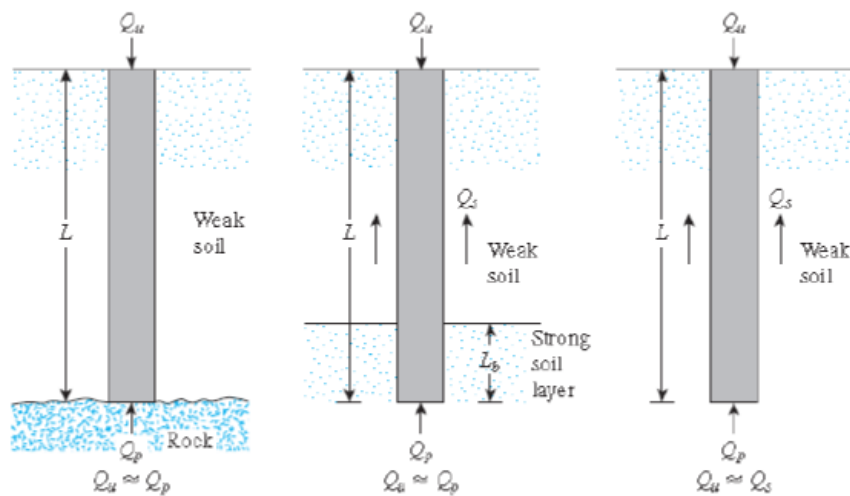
28 Ultimate capacity of concrete pile in different soils
